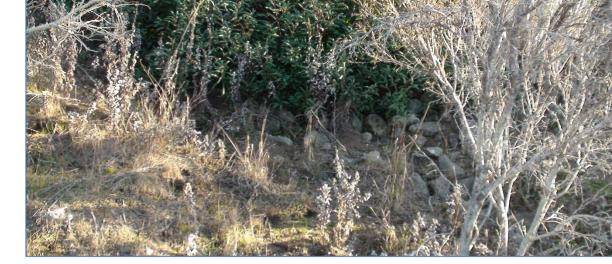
Stormwater outlet from Pete's Pond Extension to Pete's Pond, facing southeast
